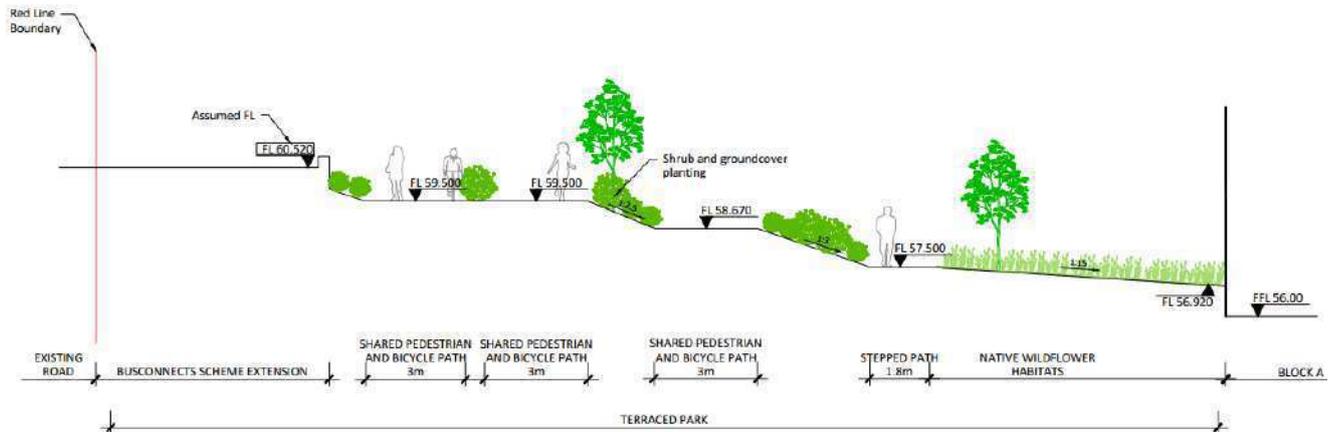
Cross Section 18m from the Site Access (With BusConnects)
